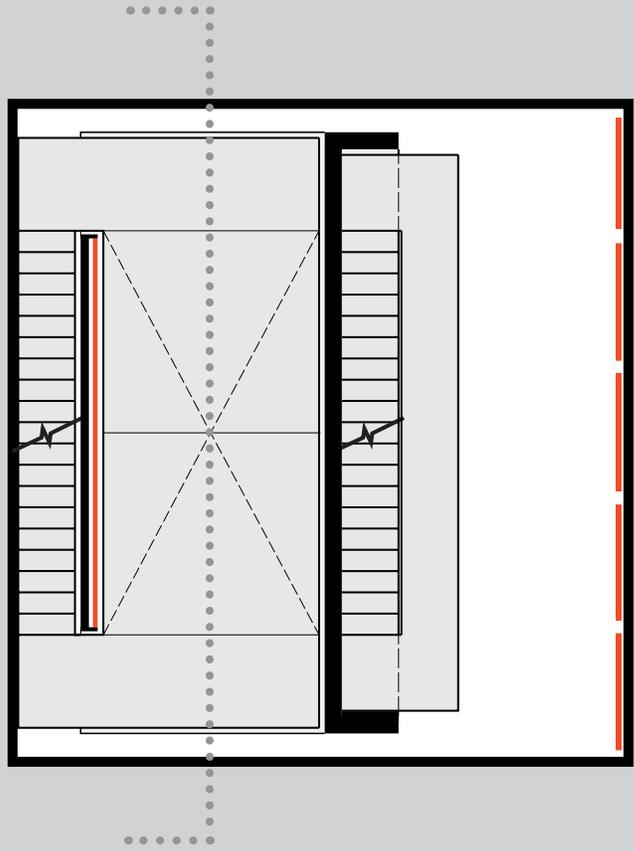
Floor plan of *IN OPPOSITION* installation space.
